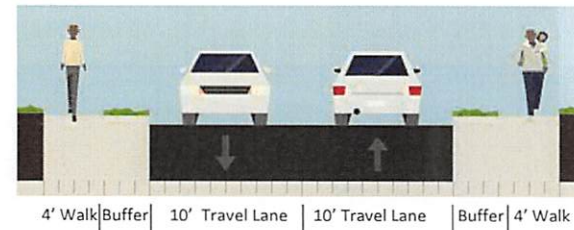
TYPICAL SECTION NORTH OF COLLEGE STREET
